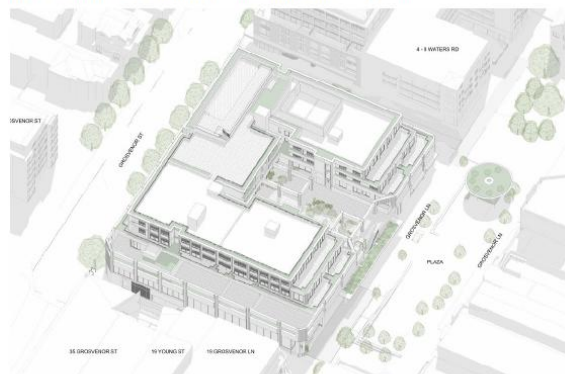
Revised 3D Modelling to the west (Source: SJB Architects)
